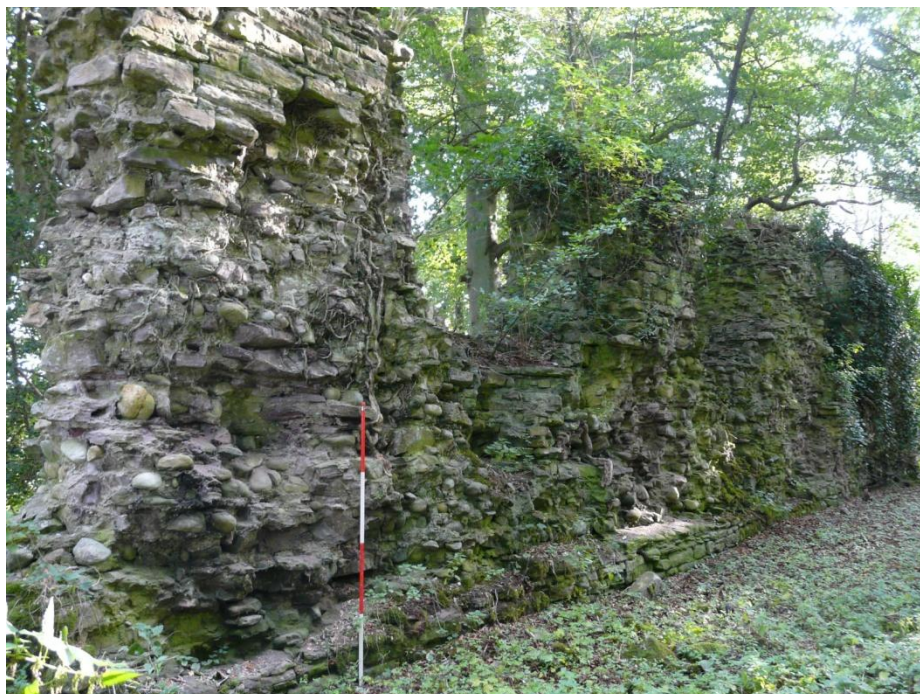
(above) - Kinclaven Castle; internal face of south-east wall from the east. Scale 500mm; photograph M. Thacker.
